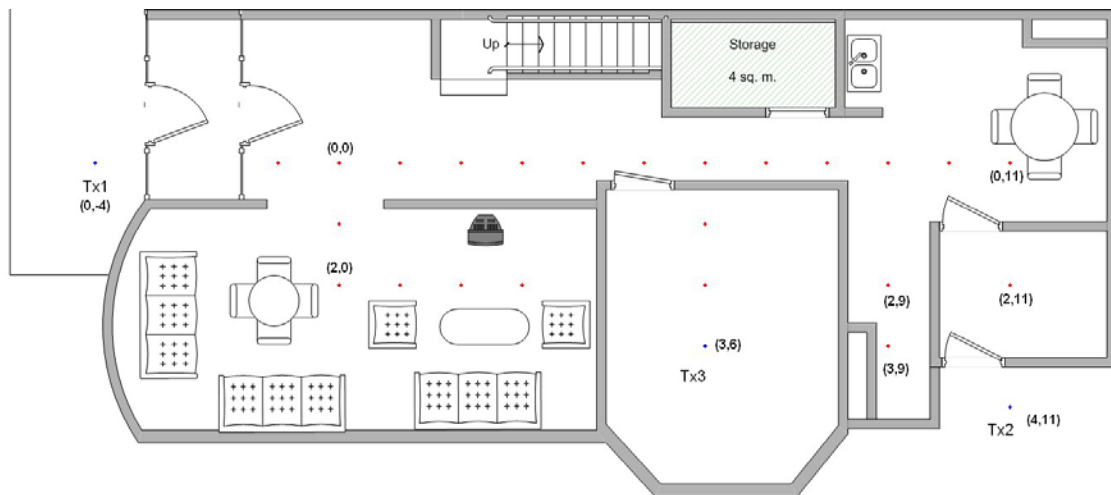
Measurement layout on first floor of 17 Schussler Road
